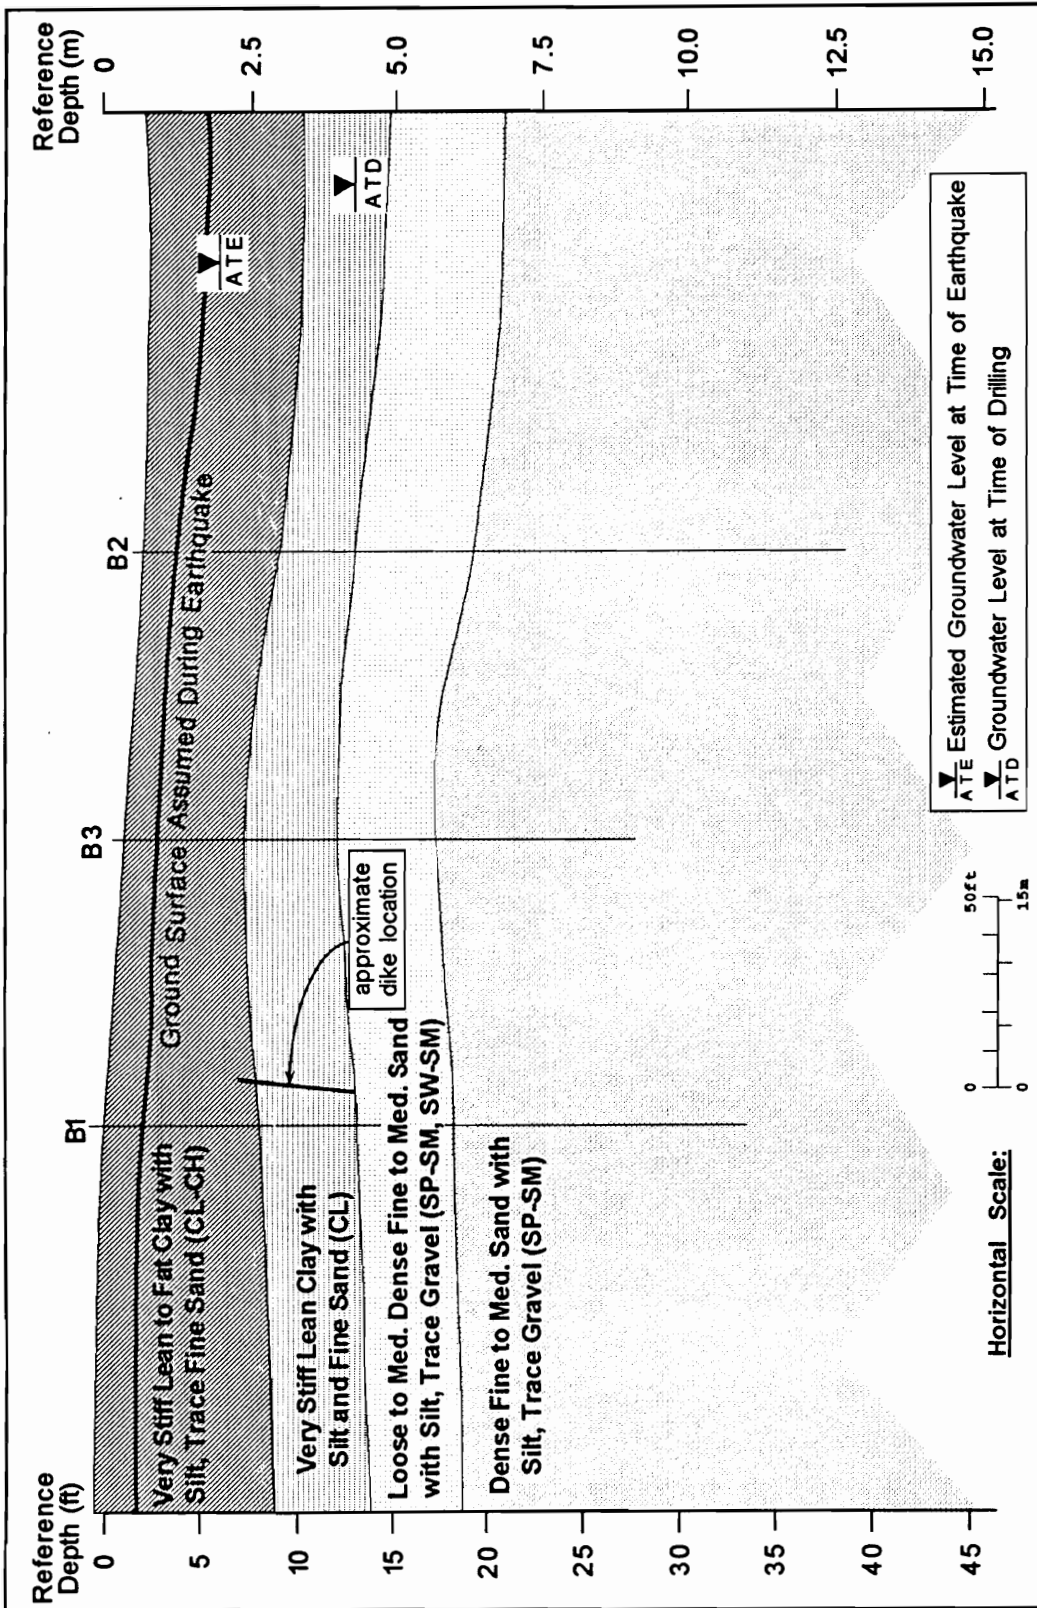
Near surface soil profile for site Veale Creek (VC)
